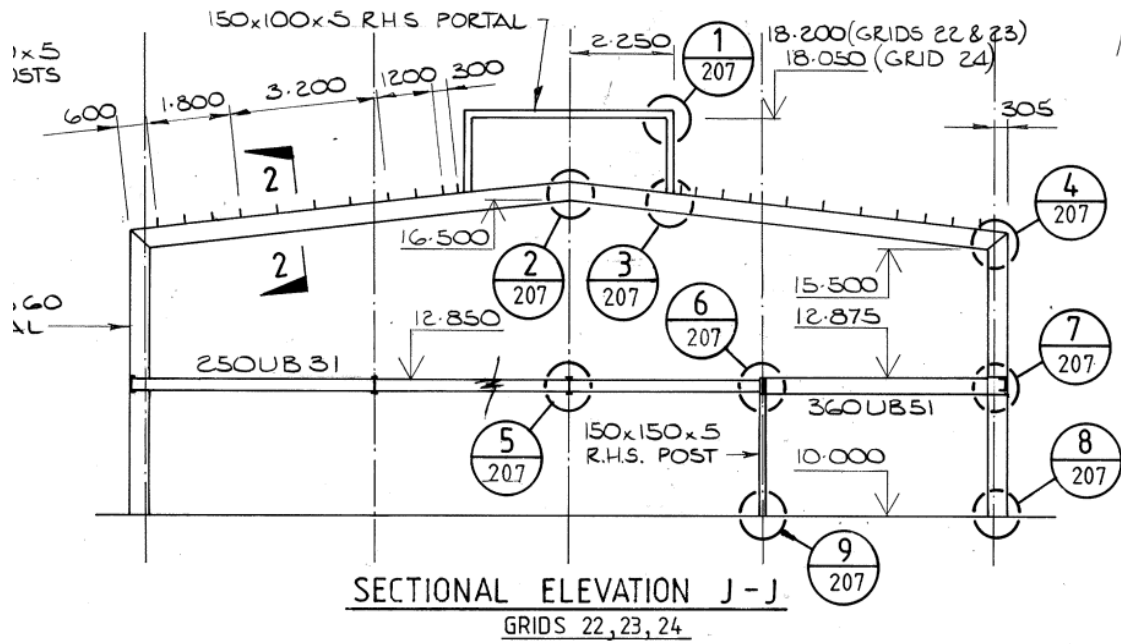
Typical Steel Portal Frame Elevation on Extension Central Wing (Grid Line 22-24)
